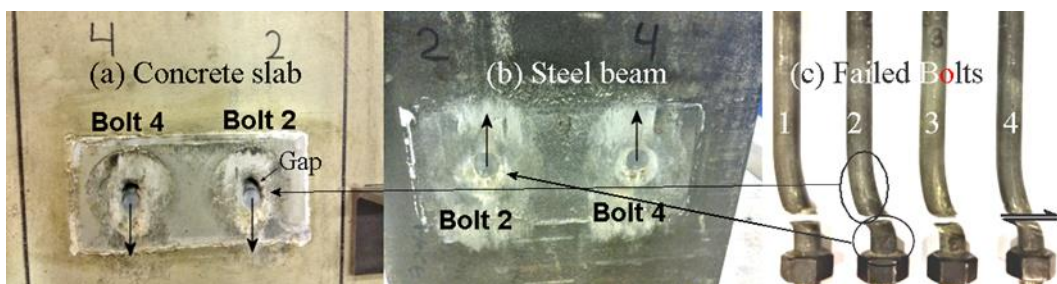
Failure of FBSC Test 5 in (a) concrete slab (b) steel beam and (c) failed bolts
